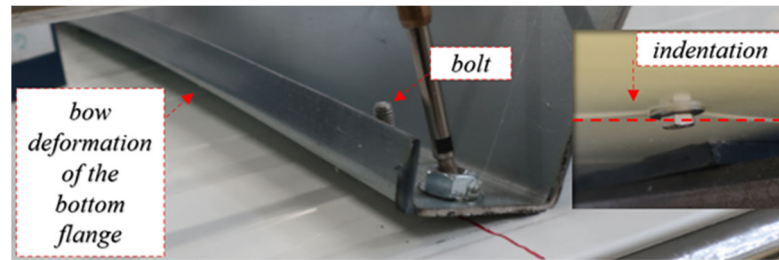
Failure mechanisms in stage II in connection using bolts: indentation at the bottom facing and bow deformation of the bottom flange.
